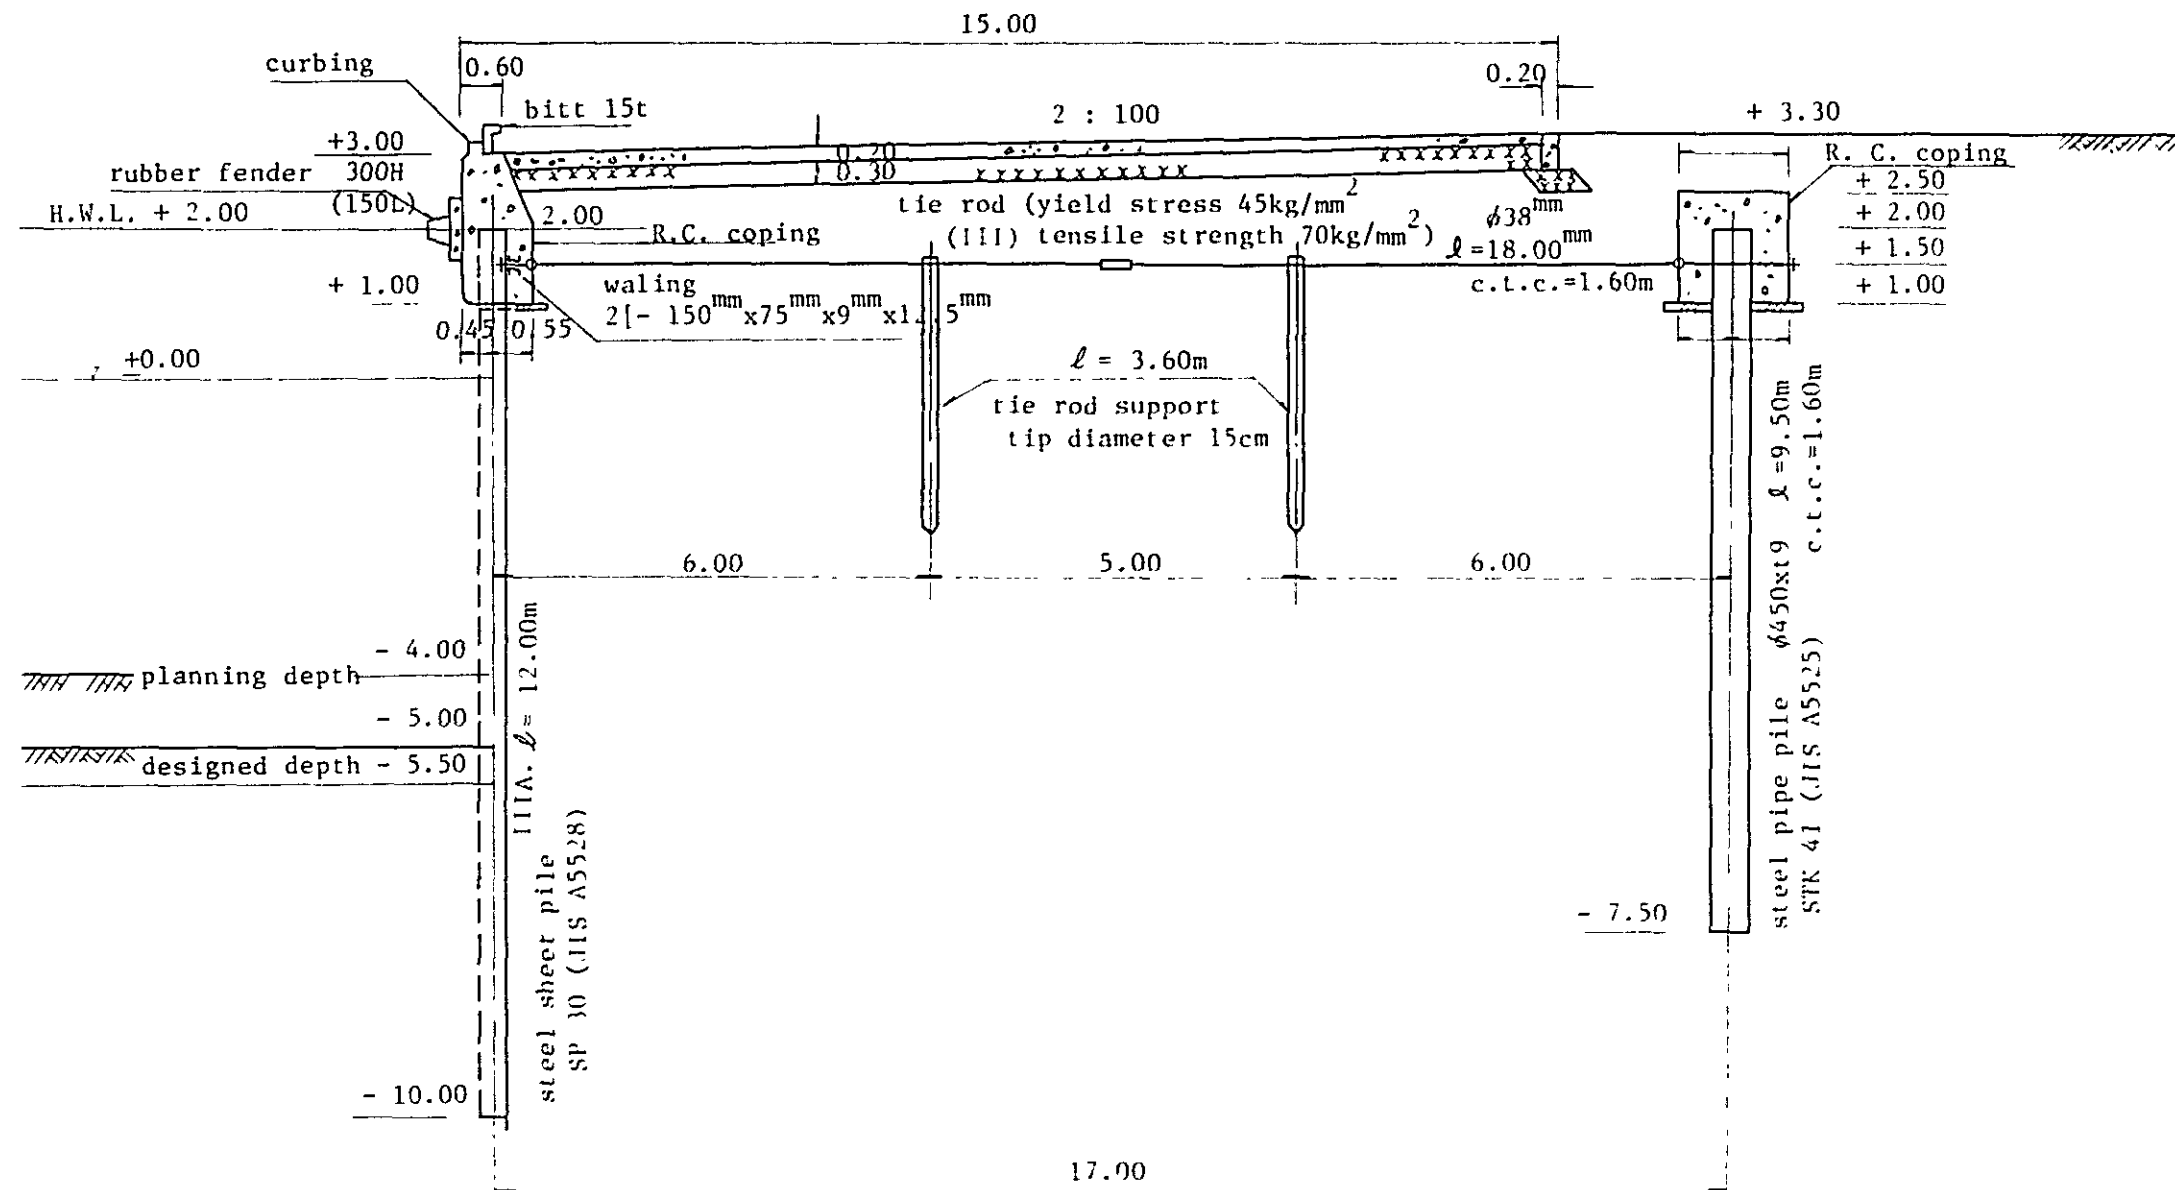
Standard Cross Section of -4.0m Quay Wall
